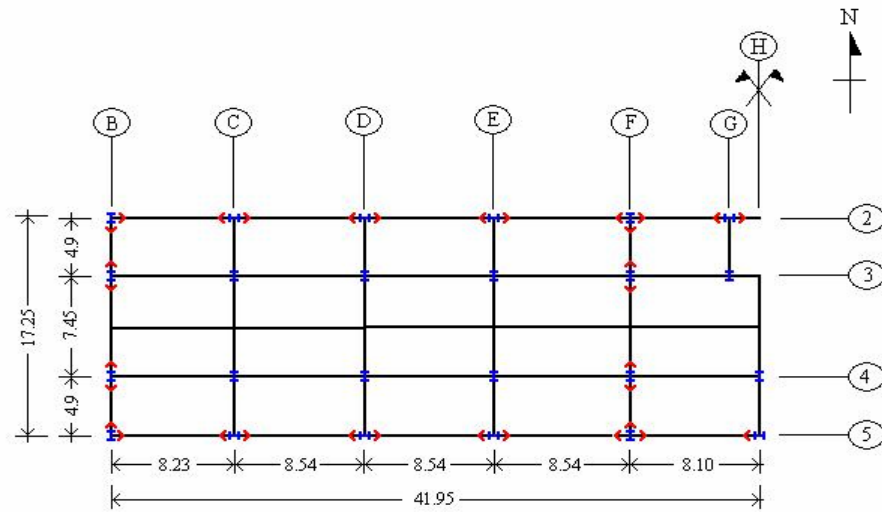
Half Plan View of Structural Framing System of the MCEER Demonstration Hospital (units in meters)
